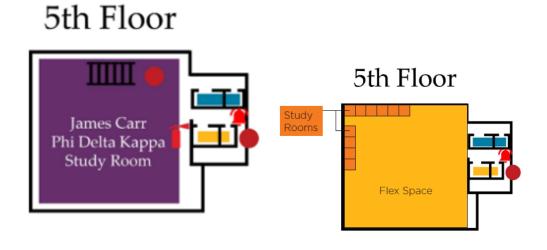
Initial and Planned Floor Plans for the Fifth Floor
